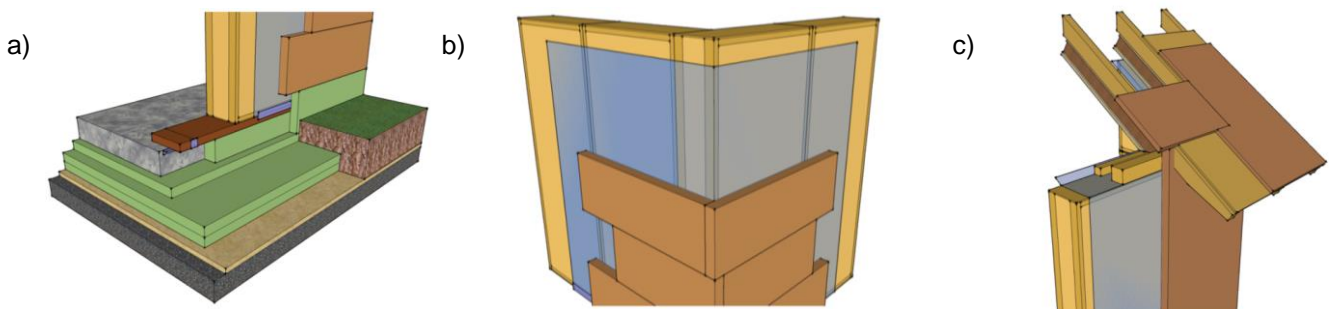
Foundation on XPS (a), wall outside corner (b) and eave (c)
